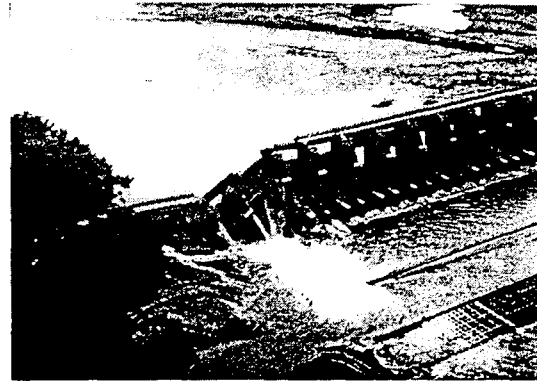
Destruction of a dam (Shihkang, Taichung County)
